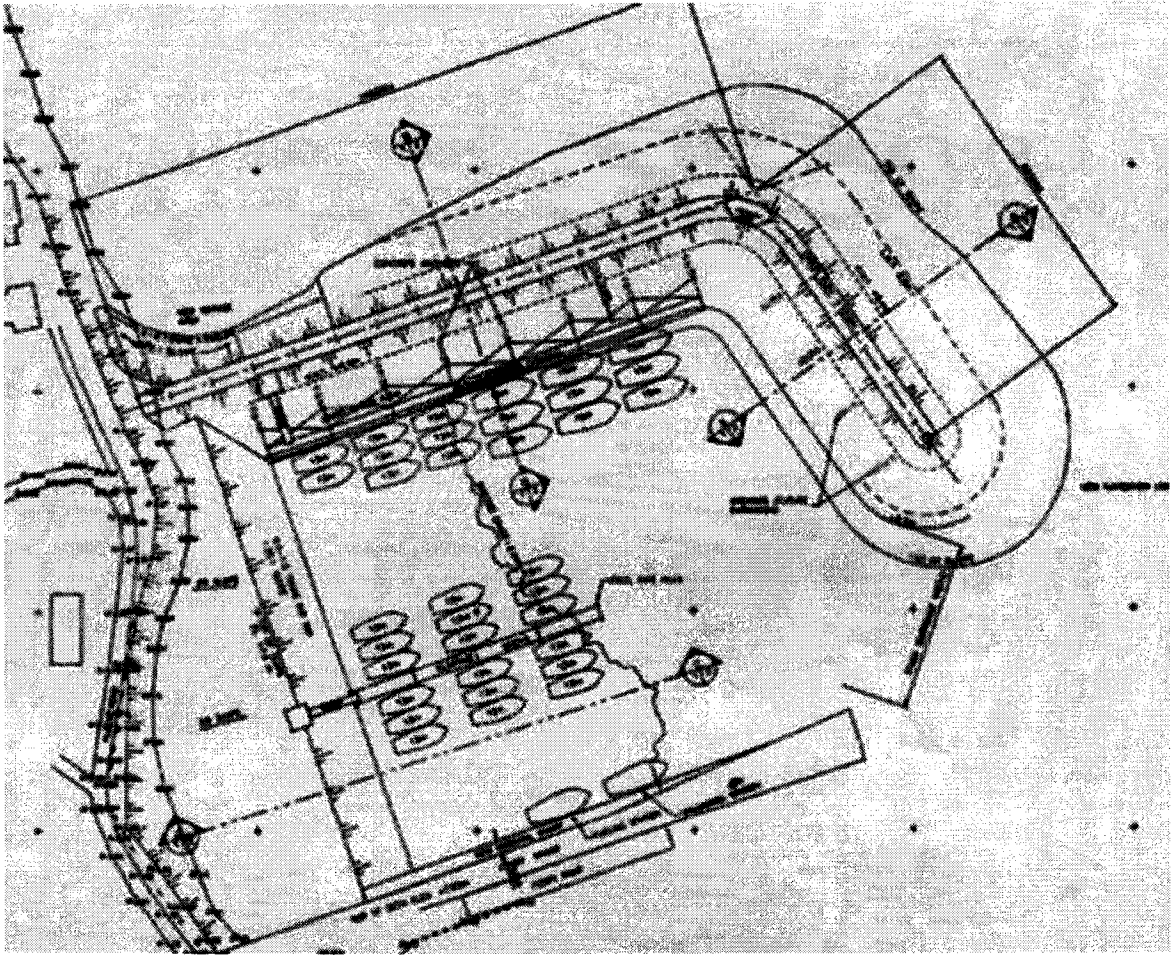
Site plan of proposed harbour development at Tiverton, N.S.
